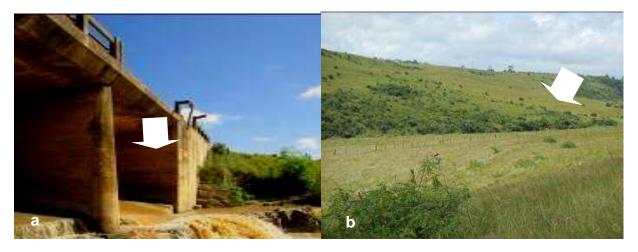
The proposed location of the Zalu Dam a) basin and b) wall.
